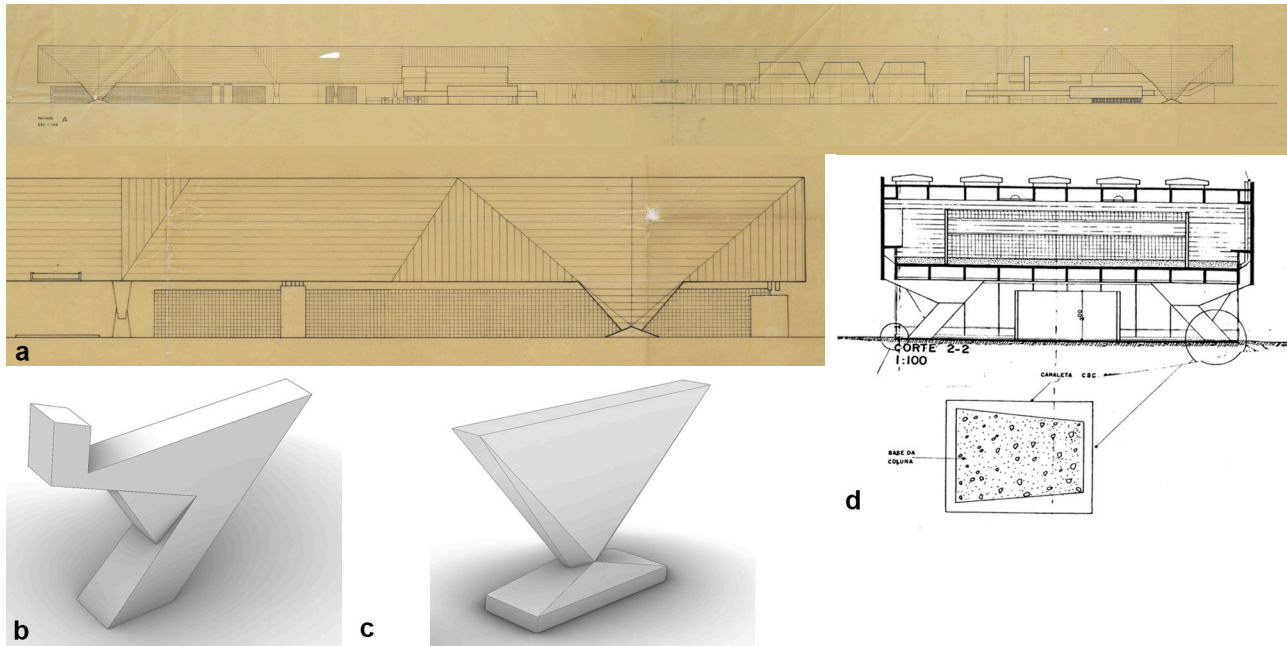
a. Original drawing of elevation view (source:Arcevos de FAUUSP); b., c.: 3D digital model of columns (elaboration by the authors); d. original vertical section (source:Arcevos de FAUUSP).
